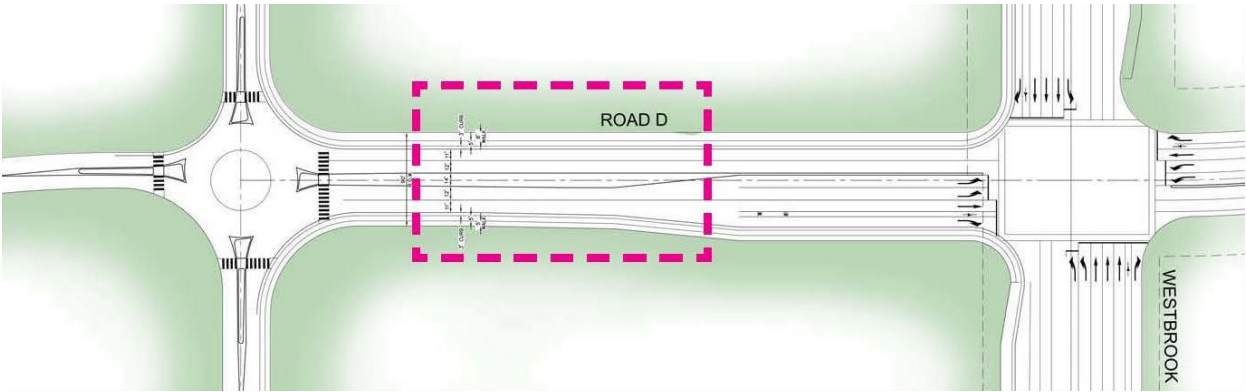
2: Modified Primary Residential Street Connections – Road D
